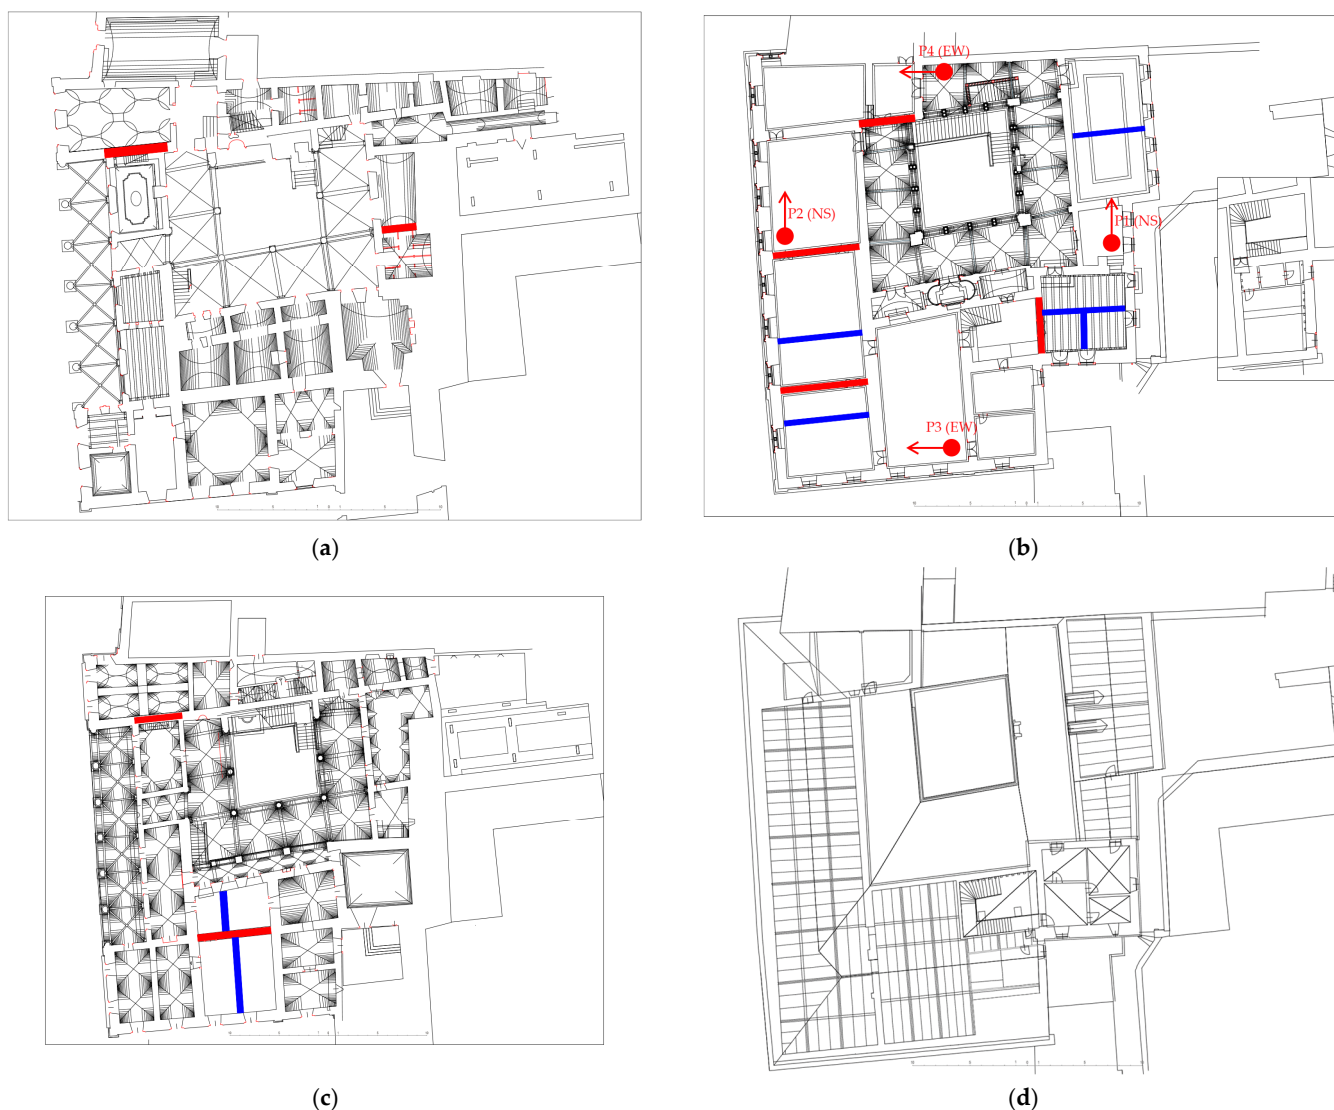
Floor plans of the Rector’s Palace after 1982–1984 retrofitting showing added/replaced (in red color) and removed (in blue color) stone masonry structural walls with reference to a pre-retrofitting design condition: (a) ground floor; (b) first floor including the position and the direction of the instruments used for ambient vibration measurements; (c) mezzanine; (d) attic (courtesy of the Institute for the Restoration of Dubrovnik).
